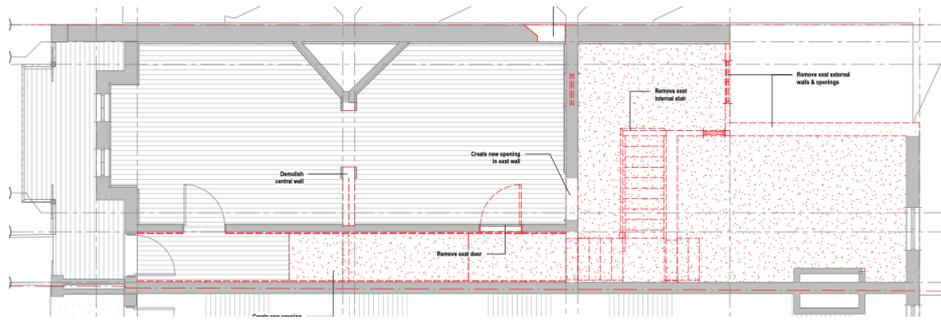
Demolition plan from the 2011 works. Note the rear wing alignment
